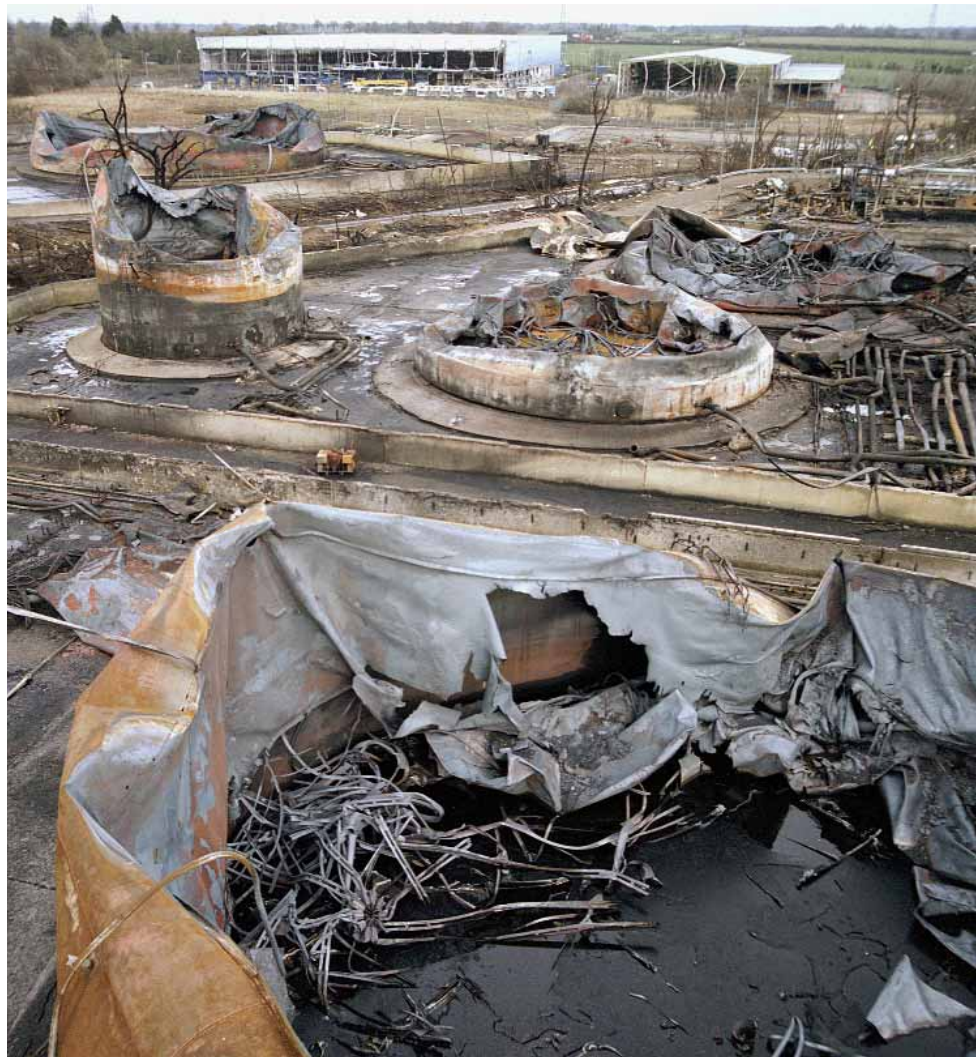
Looking west into Northgate building car park, from the position of Tank 912 (HOSL West)
